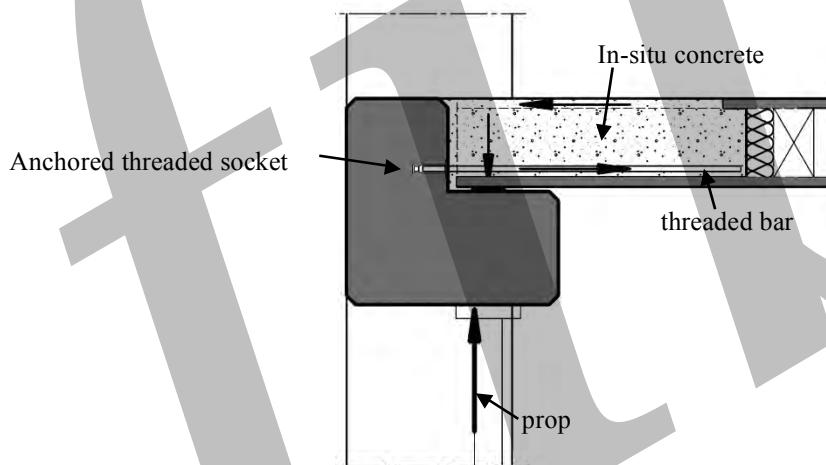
Connection between floor slab and ledge beam providing torsional restraint in a hollow-core floor.
